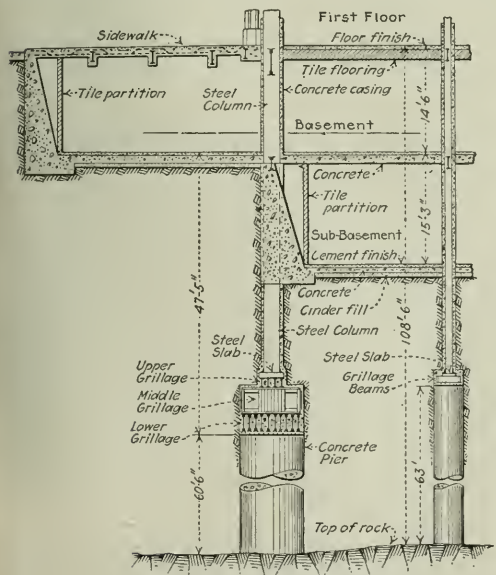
FOUNDATIONS FOR CHICAGO 32-STORY BUILDING
